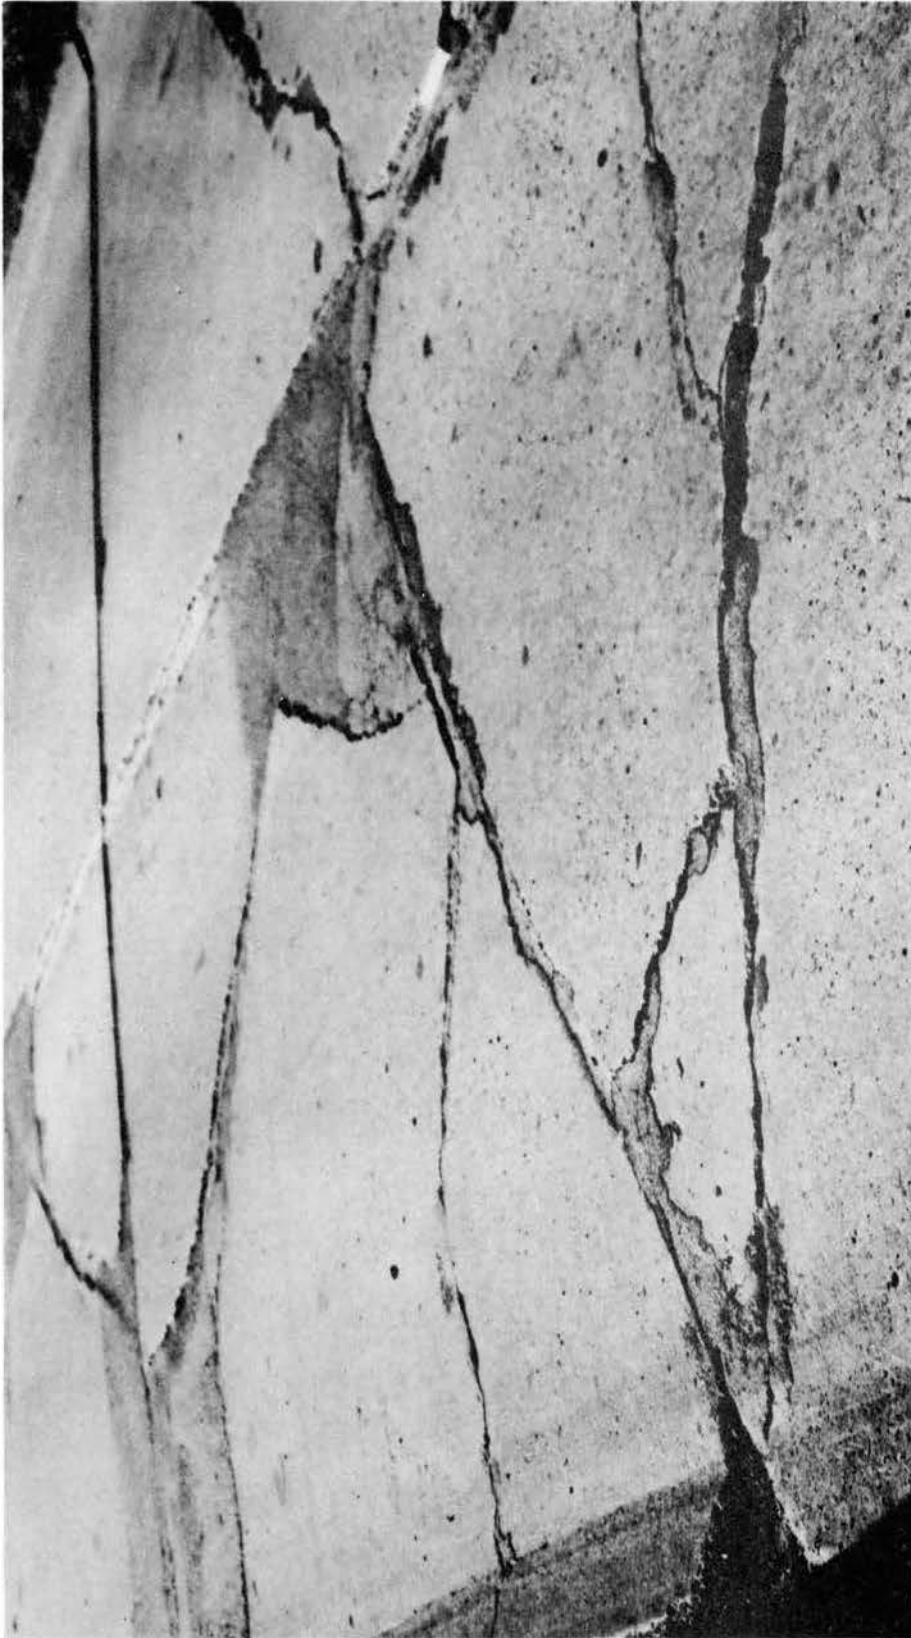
Overall View of Complete Pavement Failure
